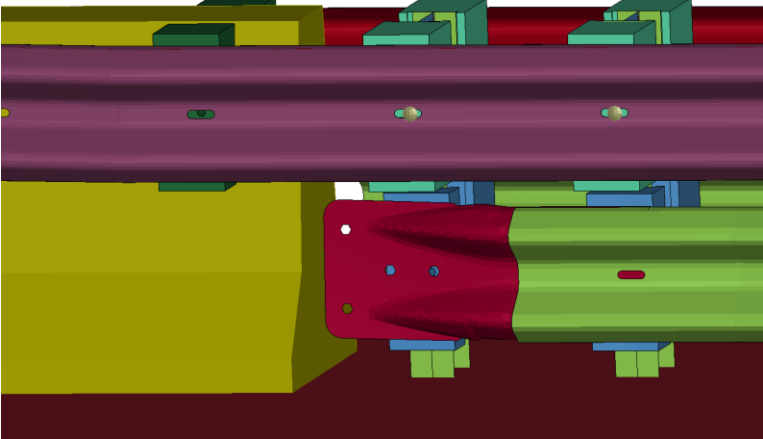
Rub Rail Transition Design with W-Beam Terminal Connector.
